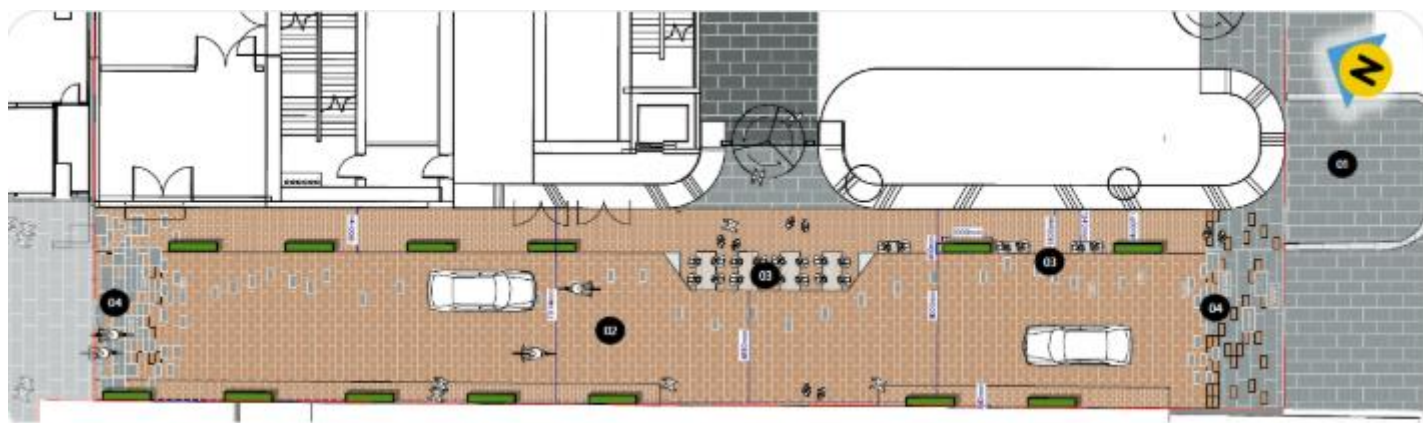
Approved shared zone for the private laneway which forms part of 55 King Street (Source: Cox Architecture)
